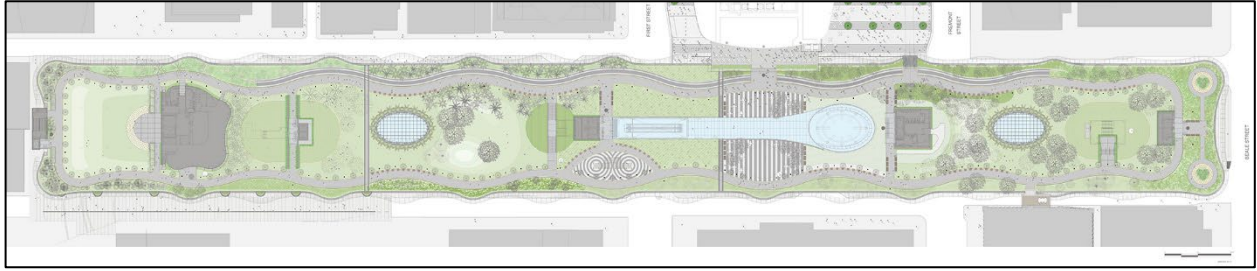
Plan view of Salesforce Park. Plan view of Salesforce Park
